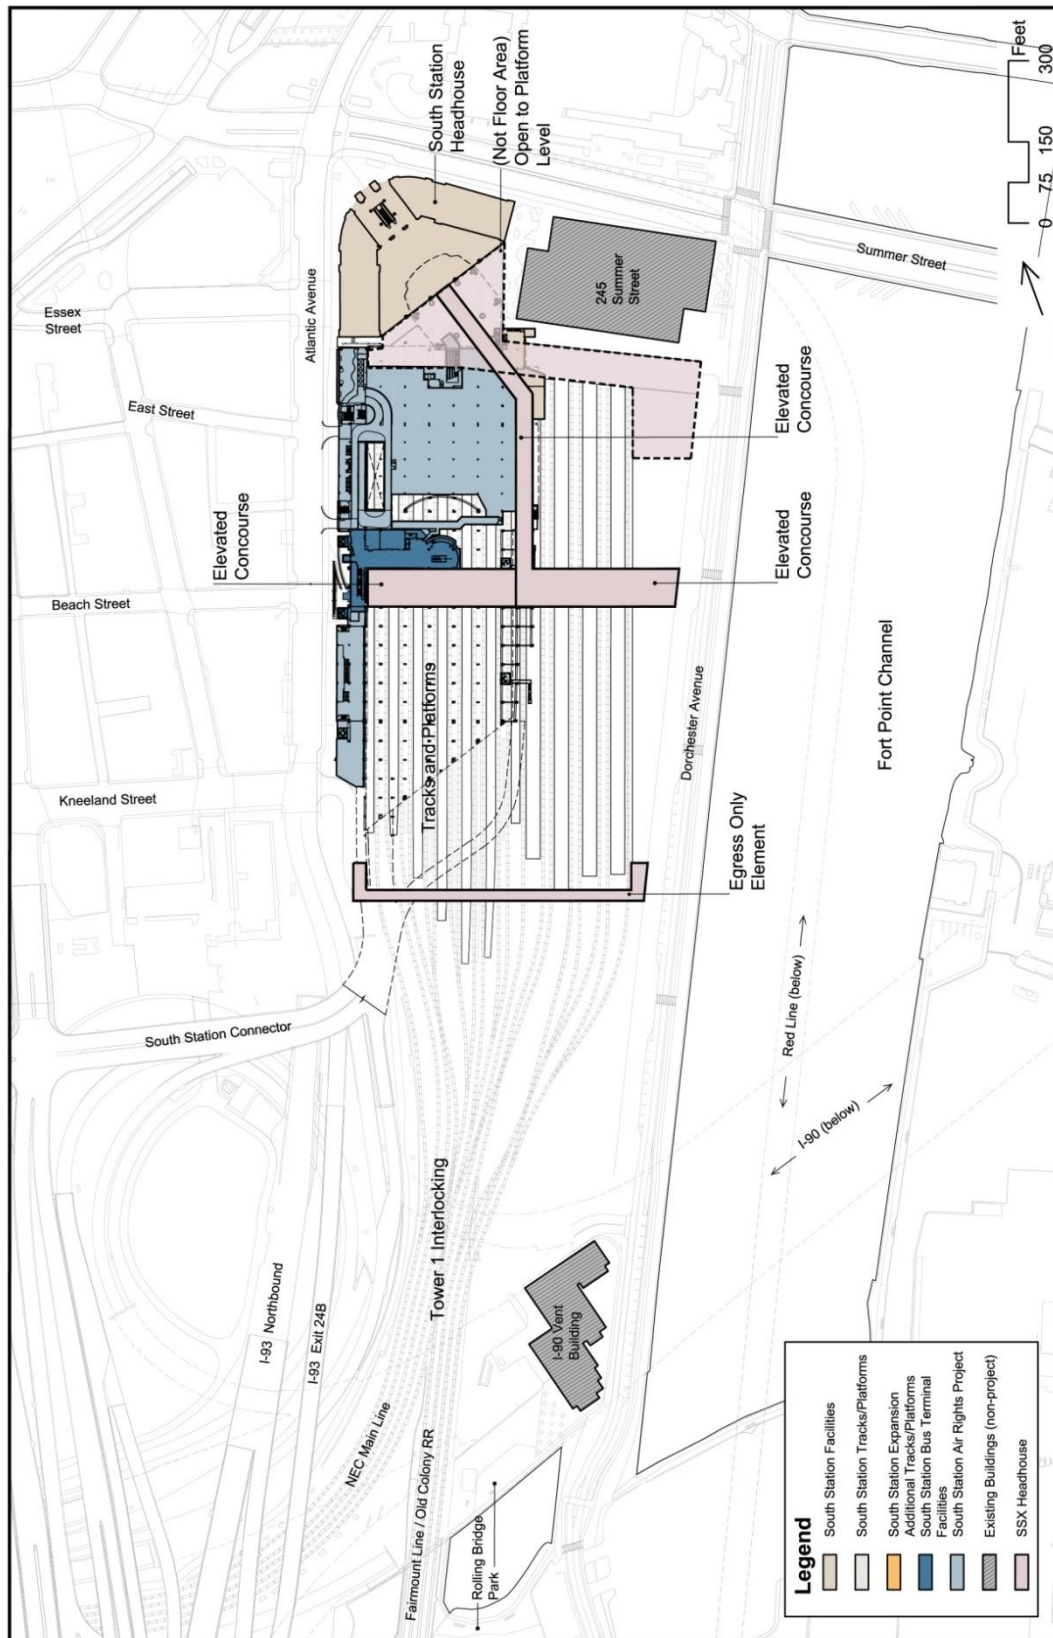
South Station Site – Proposed Elevated Concourse Level
